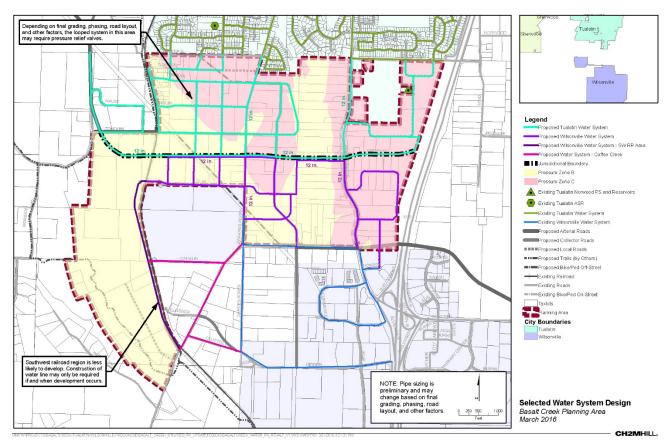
Water Systems Concept for Basalt Creek Planning Area
